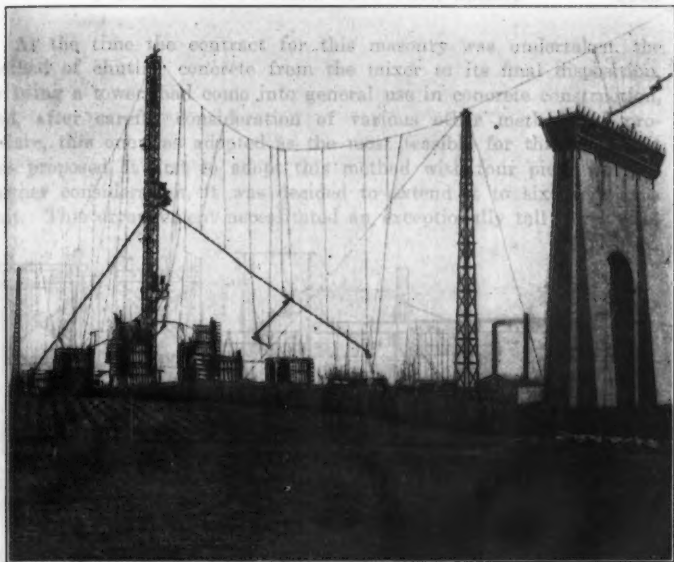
GENERAL ARRANGEMENT FOR CHUTING CONCRETE.
